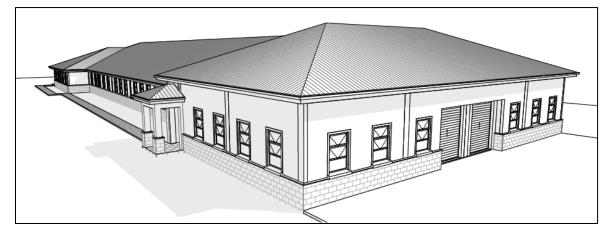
Architectural Rendering of the Lab End of the Engineering Building
